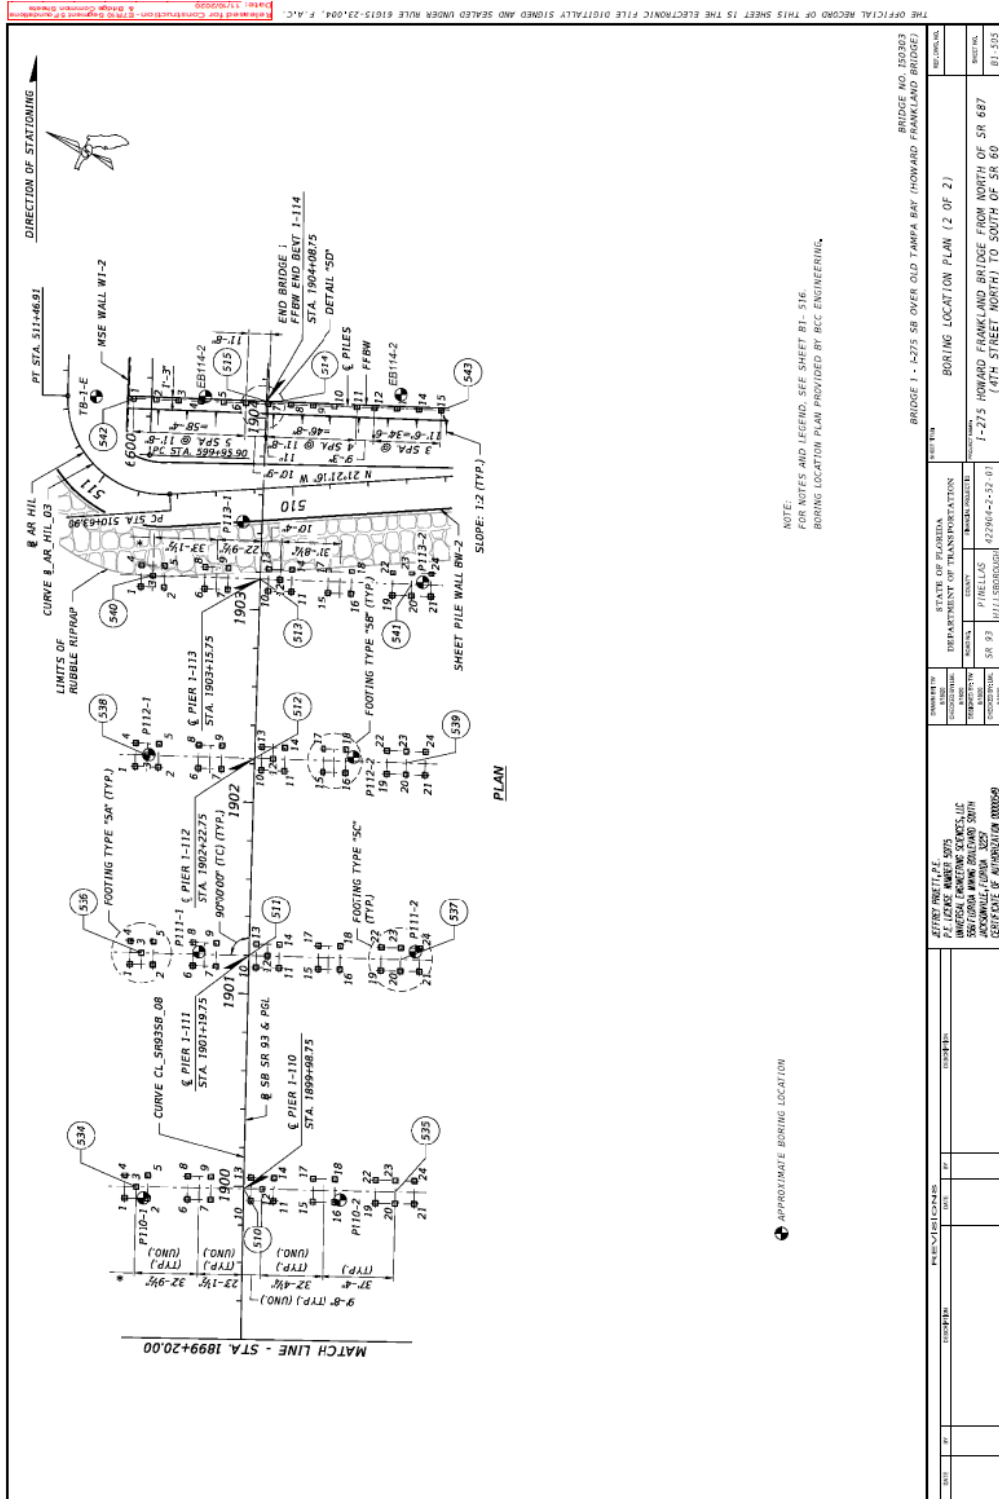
Relevant boring log plan from Howard Frankland (Pier 112-1)
